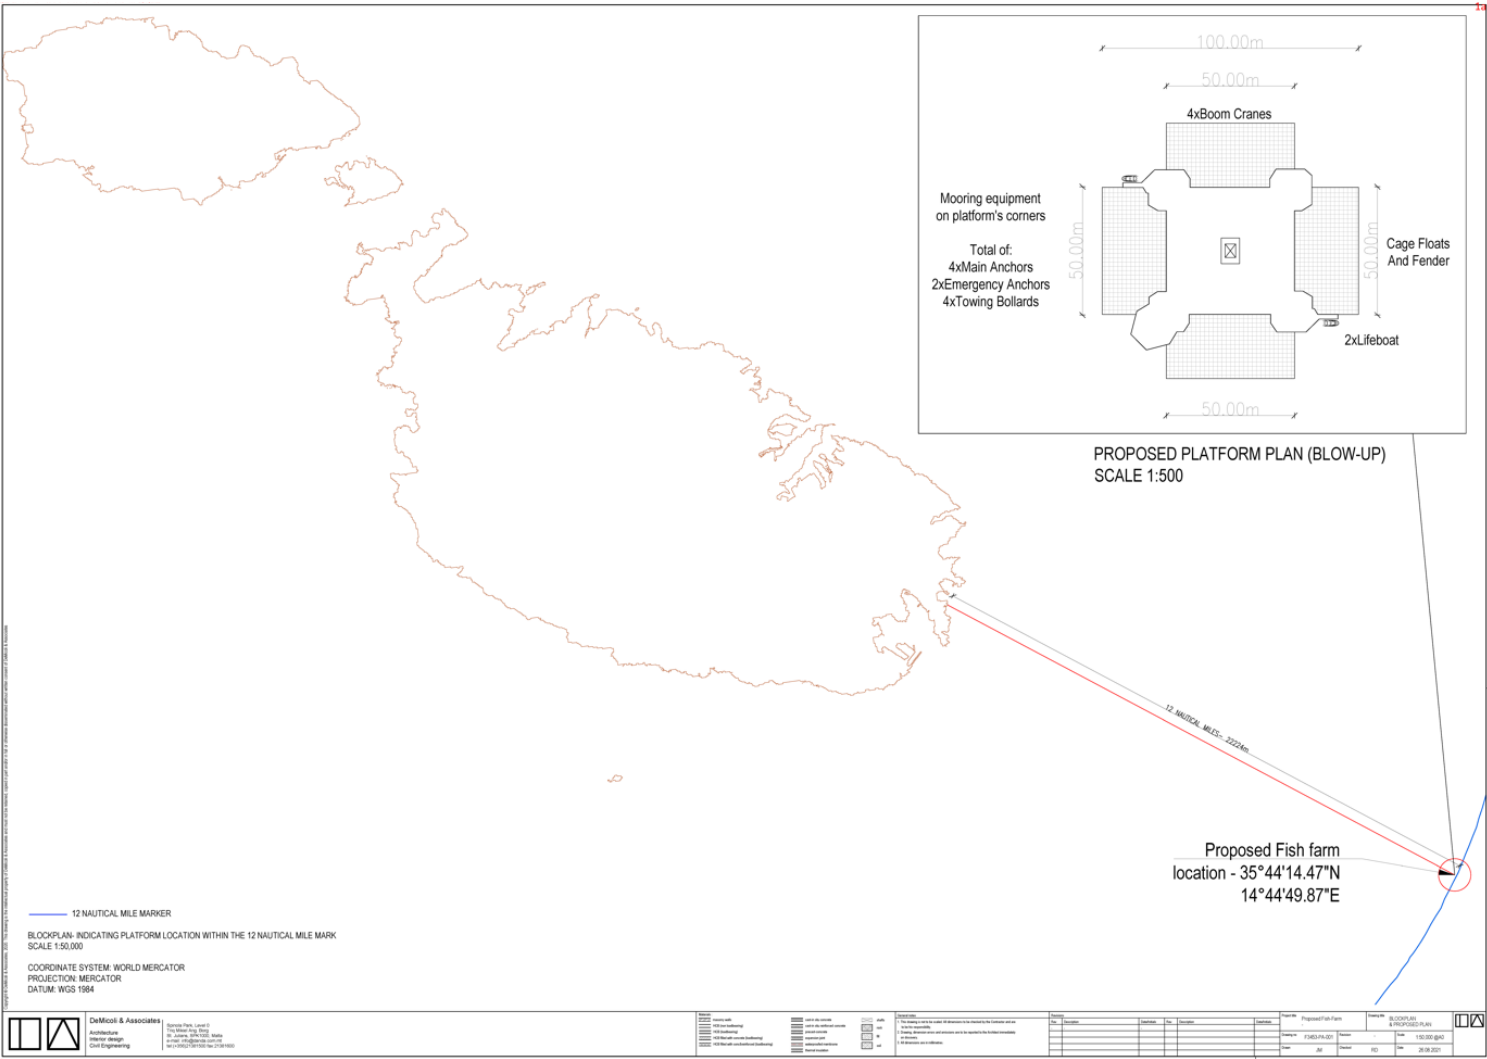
PROPOSED SITE AND PLAN OF THE FIRST PLATFORM
